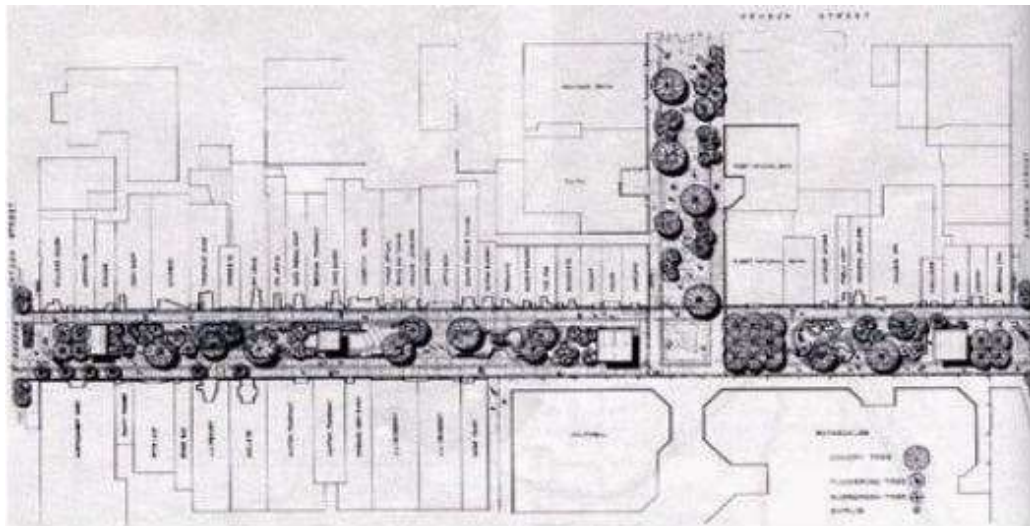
Site plan of Ithaca Commons Pedestrian Mall, New York (Rubenstein, 1992, p.142)
